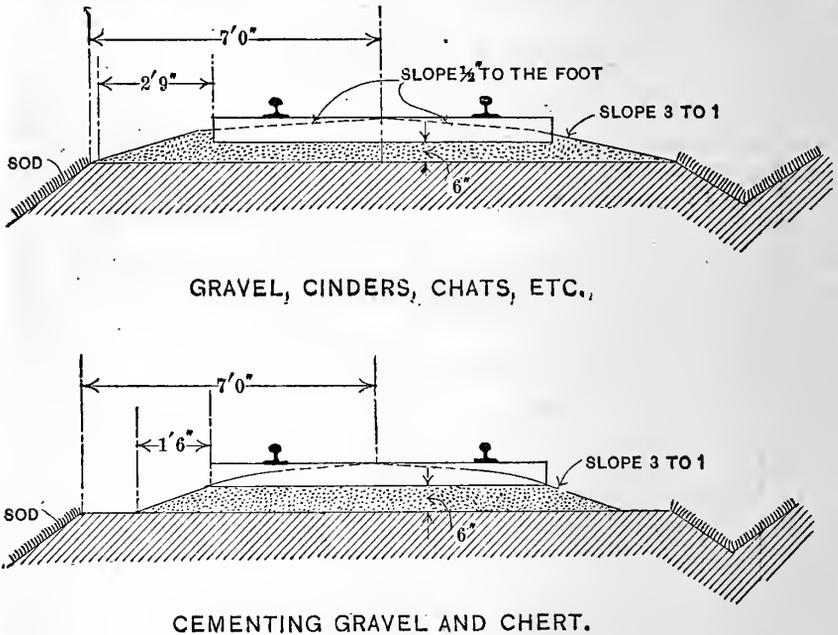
CROSS-SECTIONS OF BALLAST FOR CLASS "C" ROADS.
